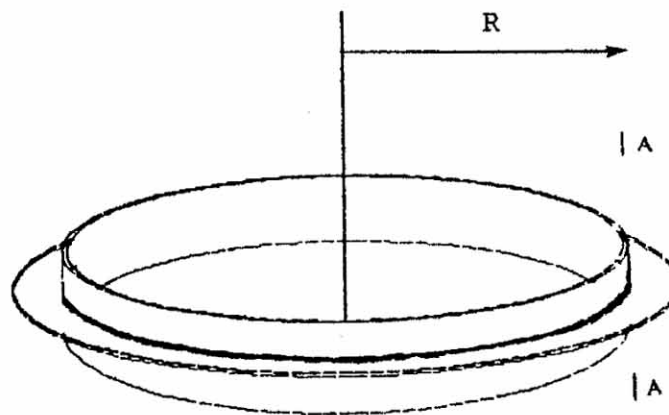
Ring stiffener assembly consisting of welded flange and web
